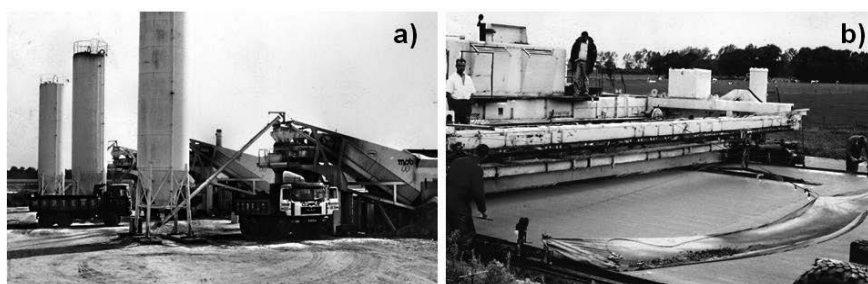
Construction of concrete layer (1997): a) concrete batching plant, b) placing concrete (source: Z. Tokarski)
